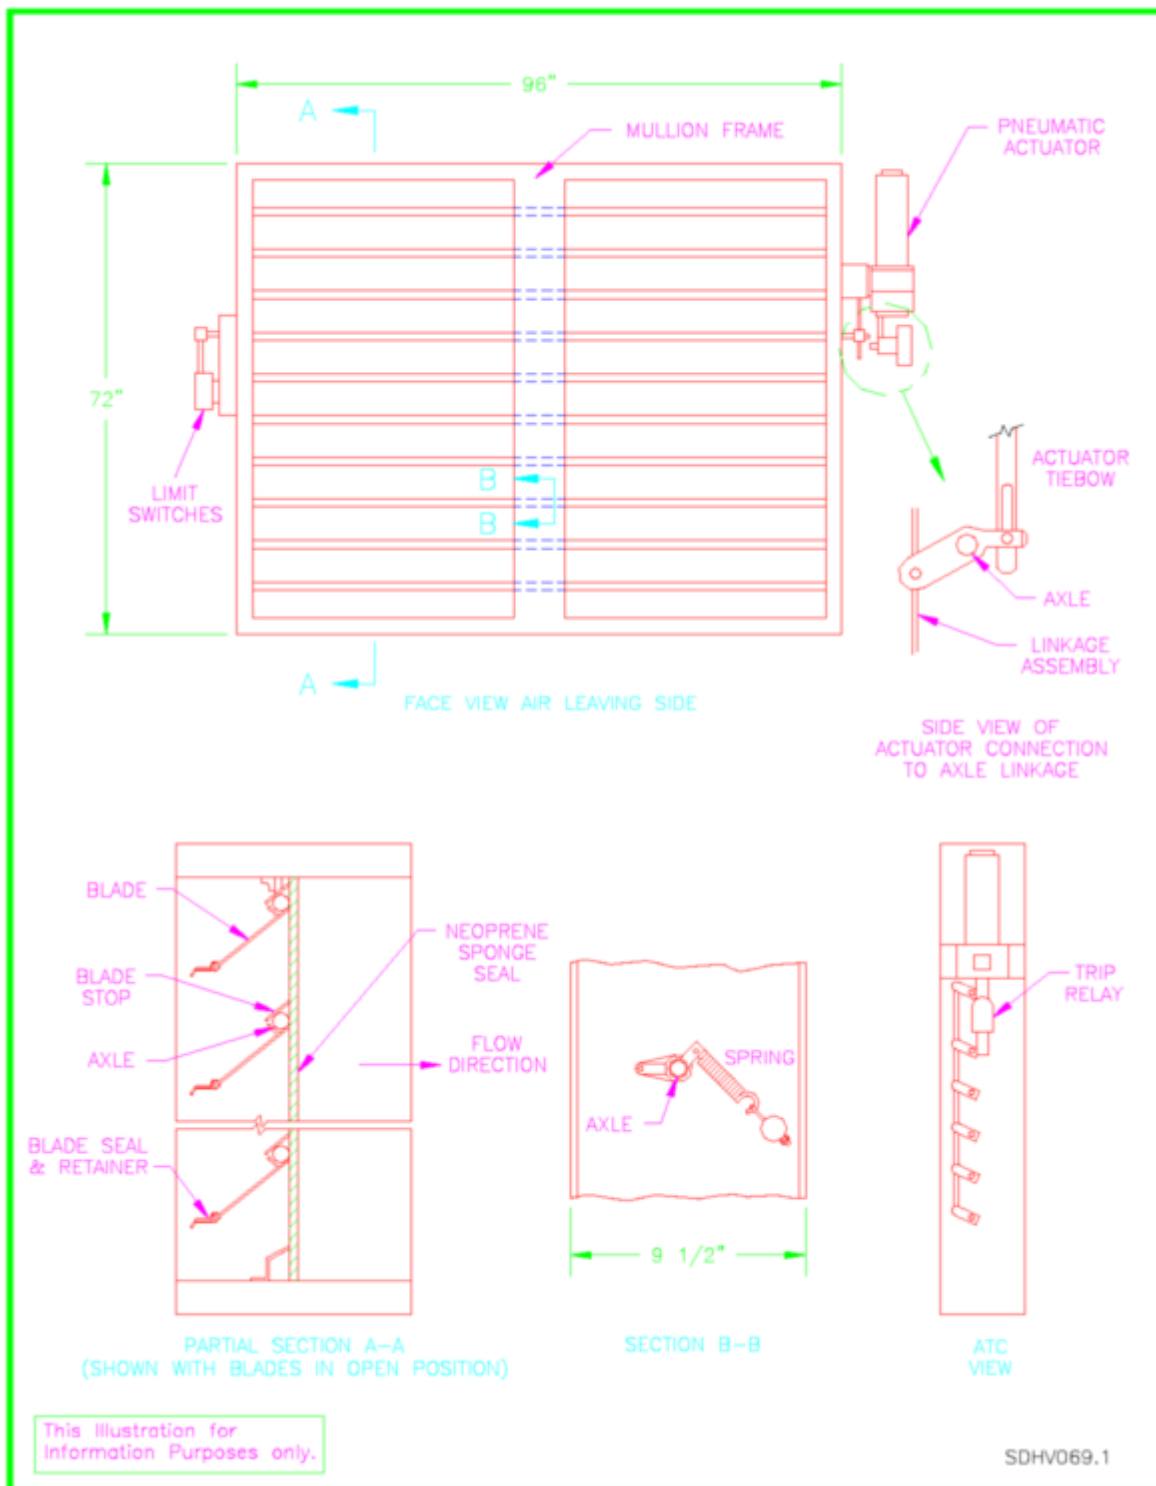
WHB Exhaust Duct Tornado Damper Layout and Detail
